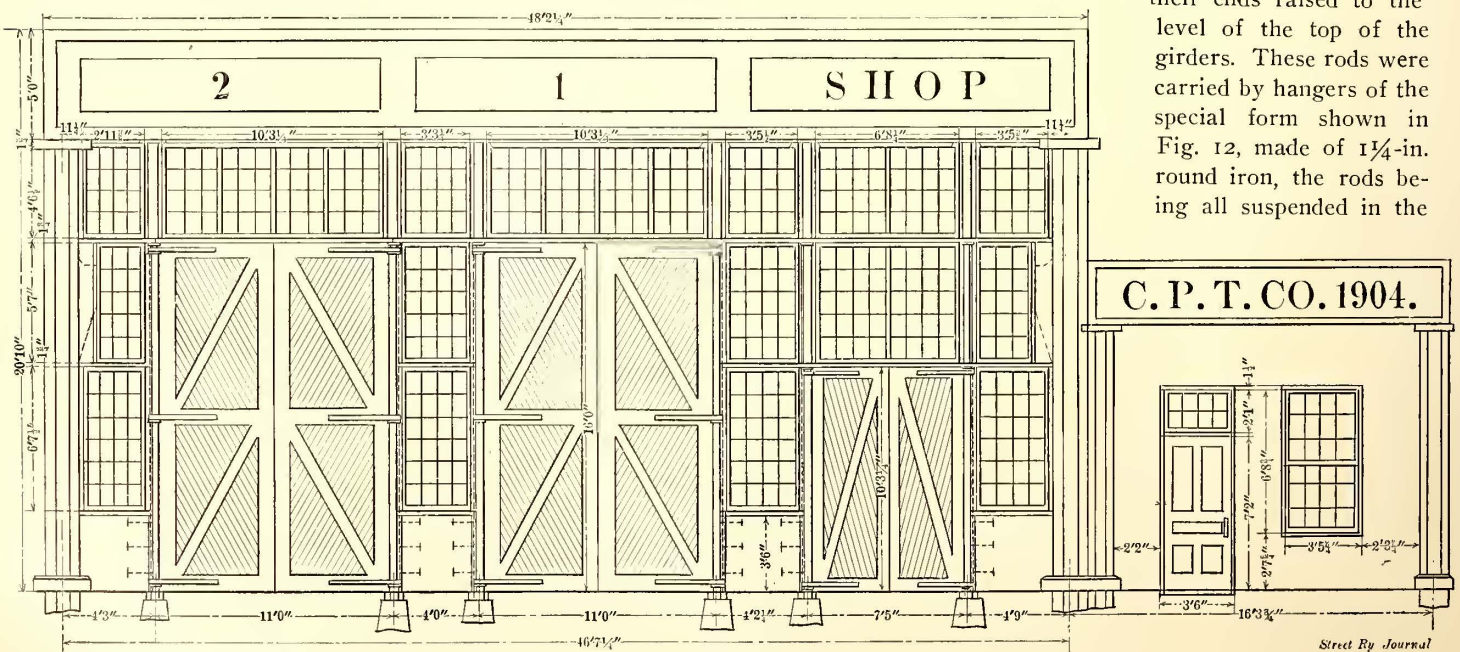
FRONT ELEVATION OF CAR HOUSE BUILT FOR THE CENTRAL PENNSYLVANIA TRACTION COMPANY
